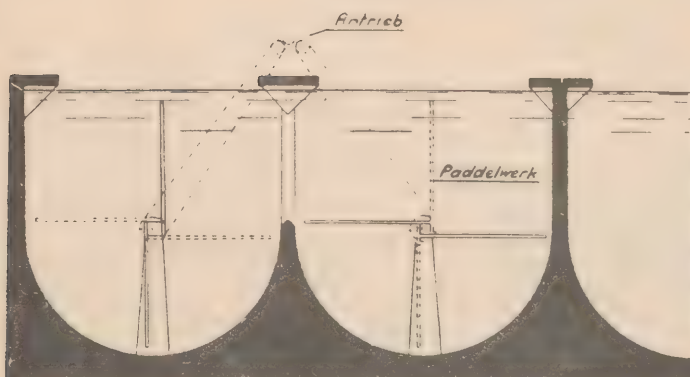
i, Niers District Plant No.1. Mixing Tank
